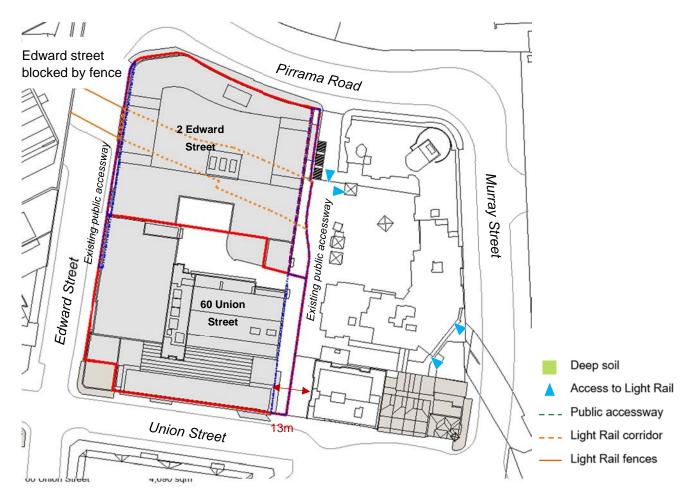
existing site plan for 2 Edward Street & 60 Union Street
